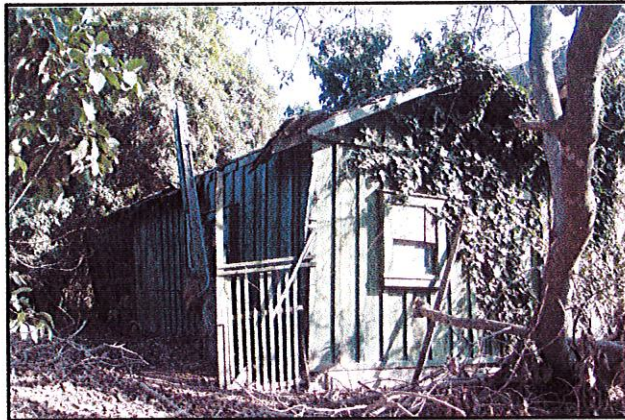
Small garage, built ca. 1930. This view is facing southeast, toward the west (rear) and north elevations. Note the board-and-batten exterior wall cladding. Photograph date, November 5, 2002.
